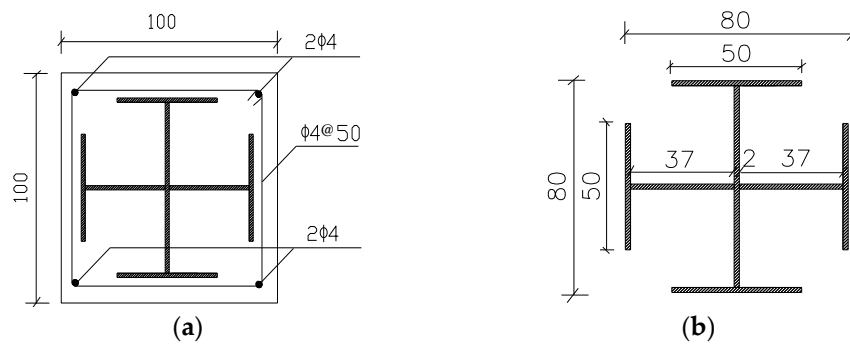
(a) Column section and dimension; (b) dimension of steel skeleton (unit: mm).
